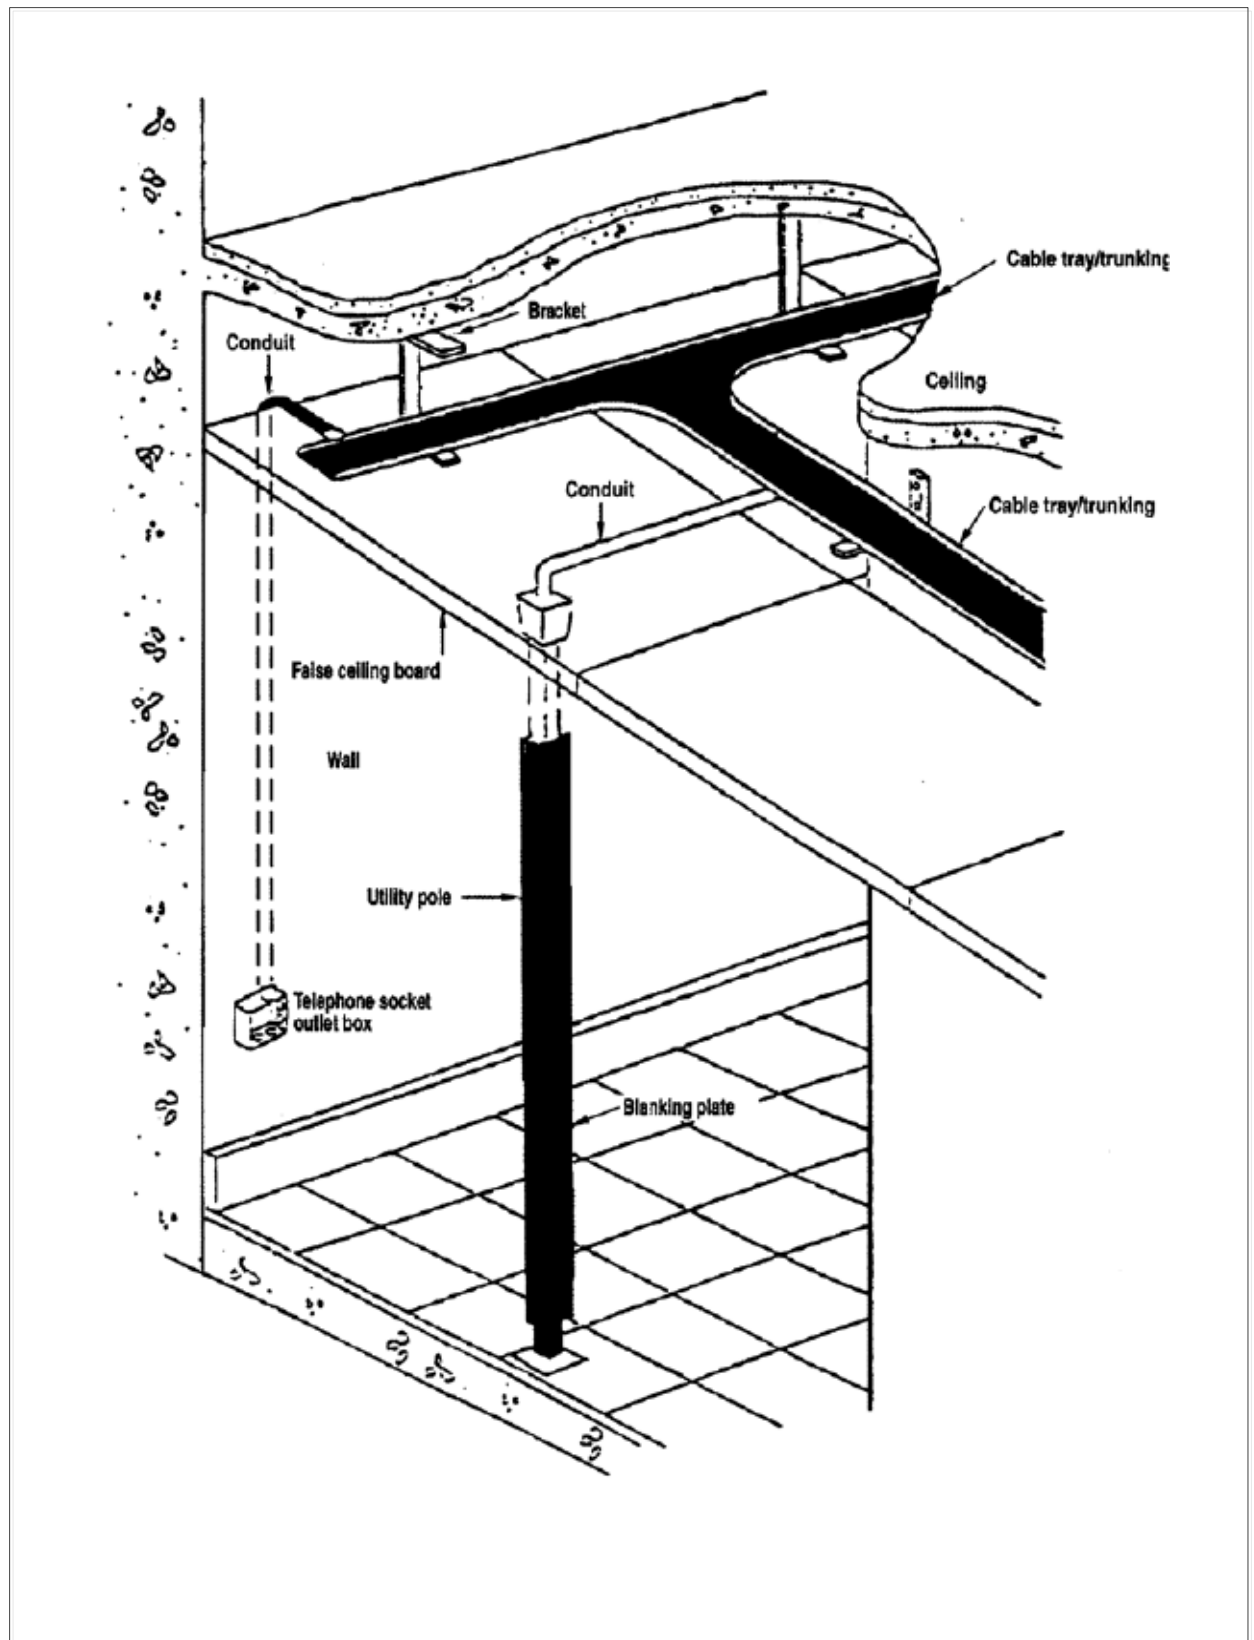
Ceiling distribution system using cable/trunking link with conduit and utility pole
